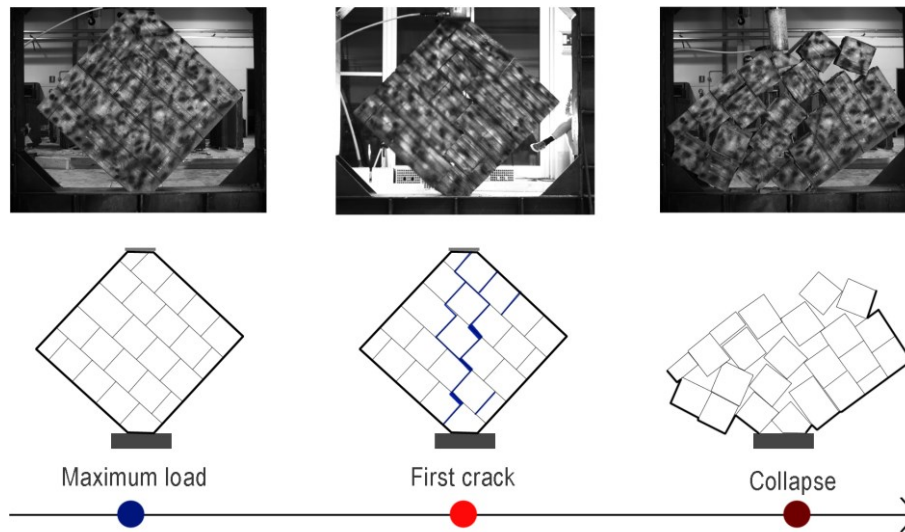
History of the cracking pattern of the wallette under diagonal compression load.
